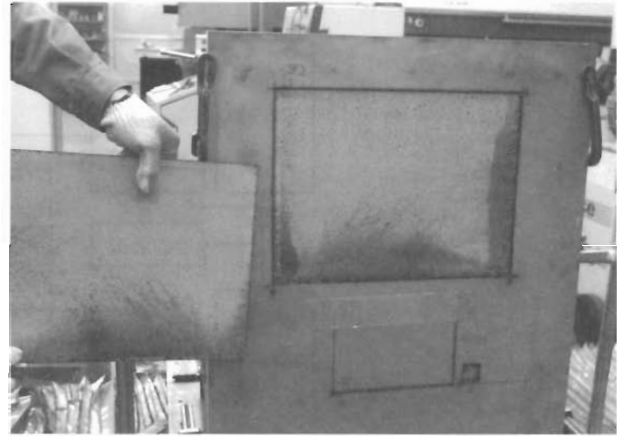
Liner Stripped from Concrete after Cutting in the Horizontal Position
